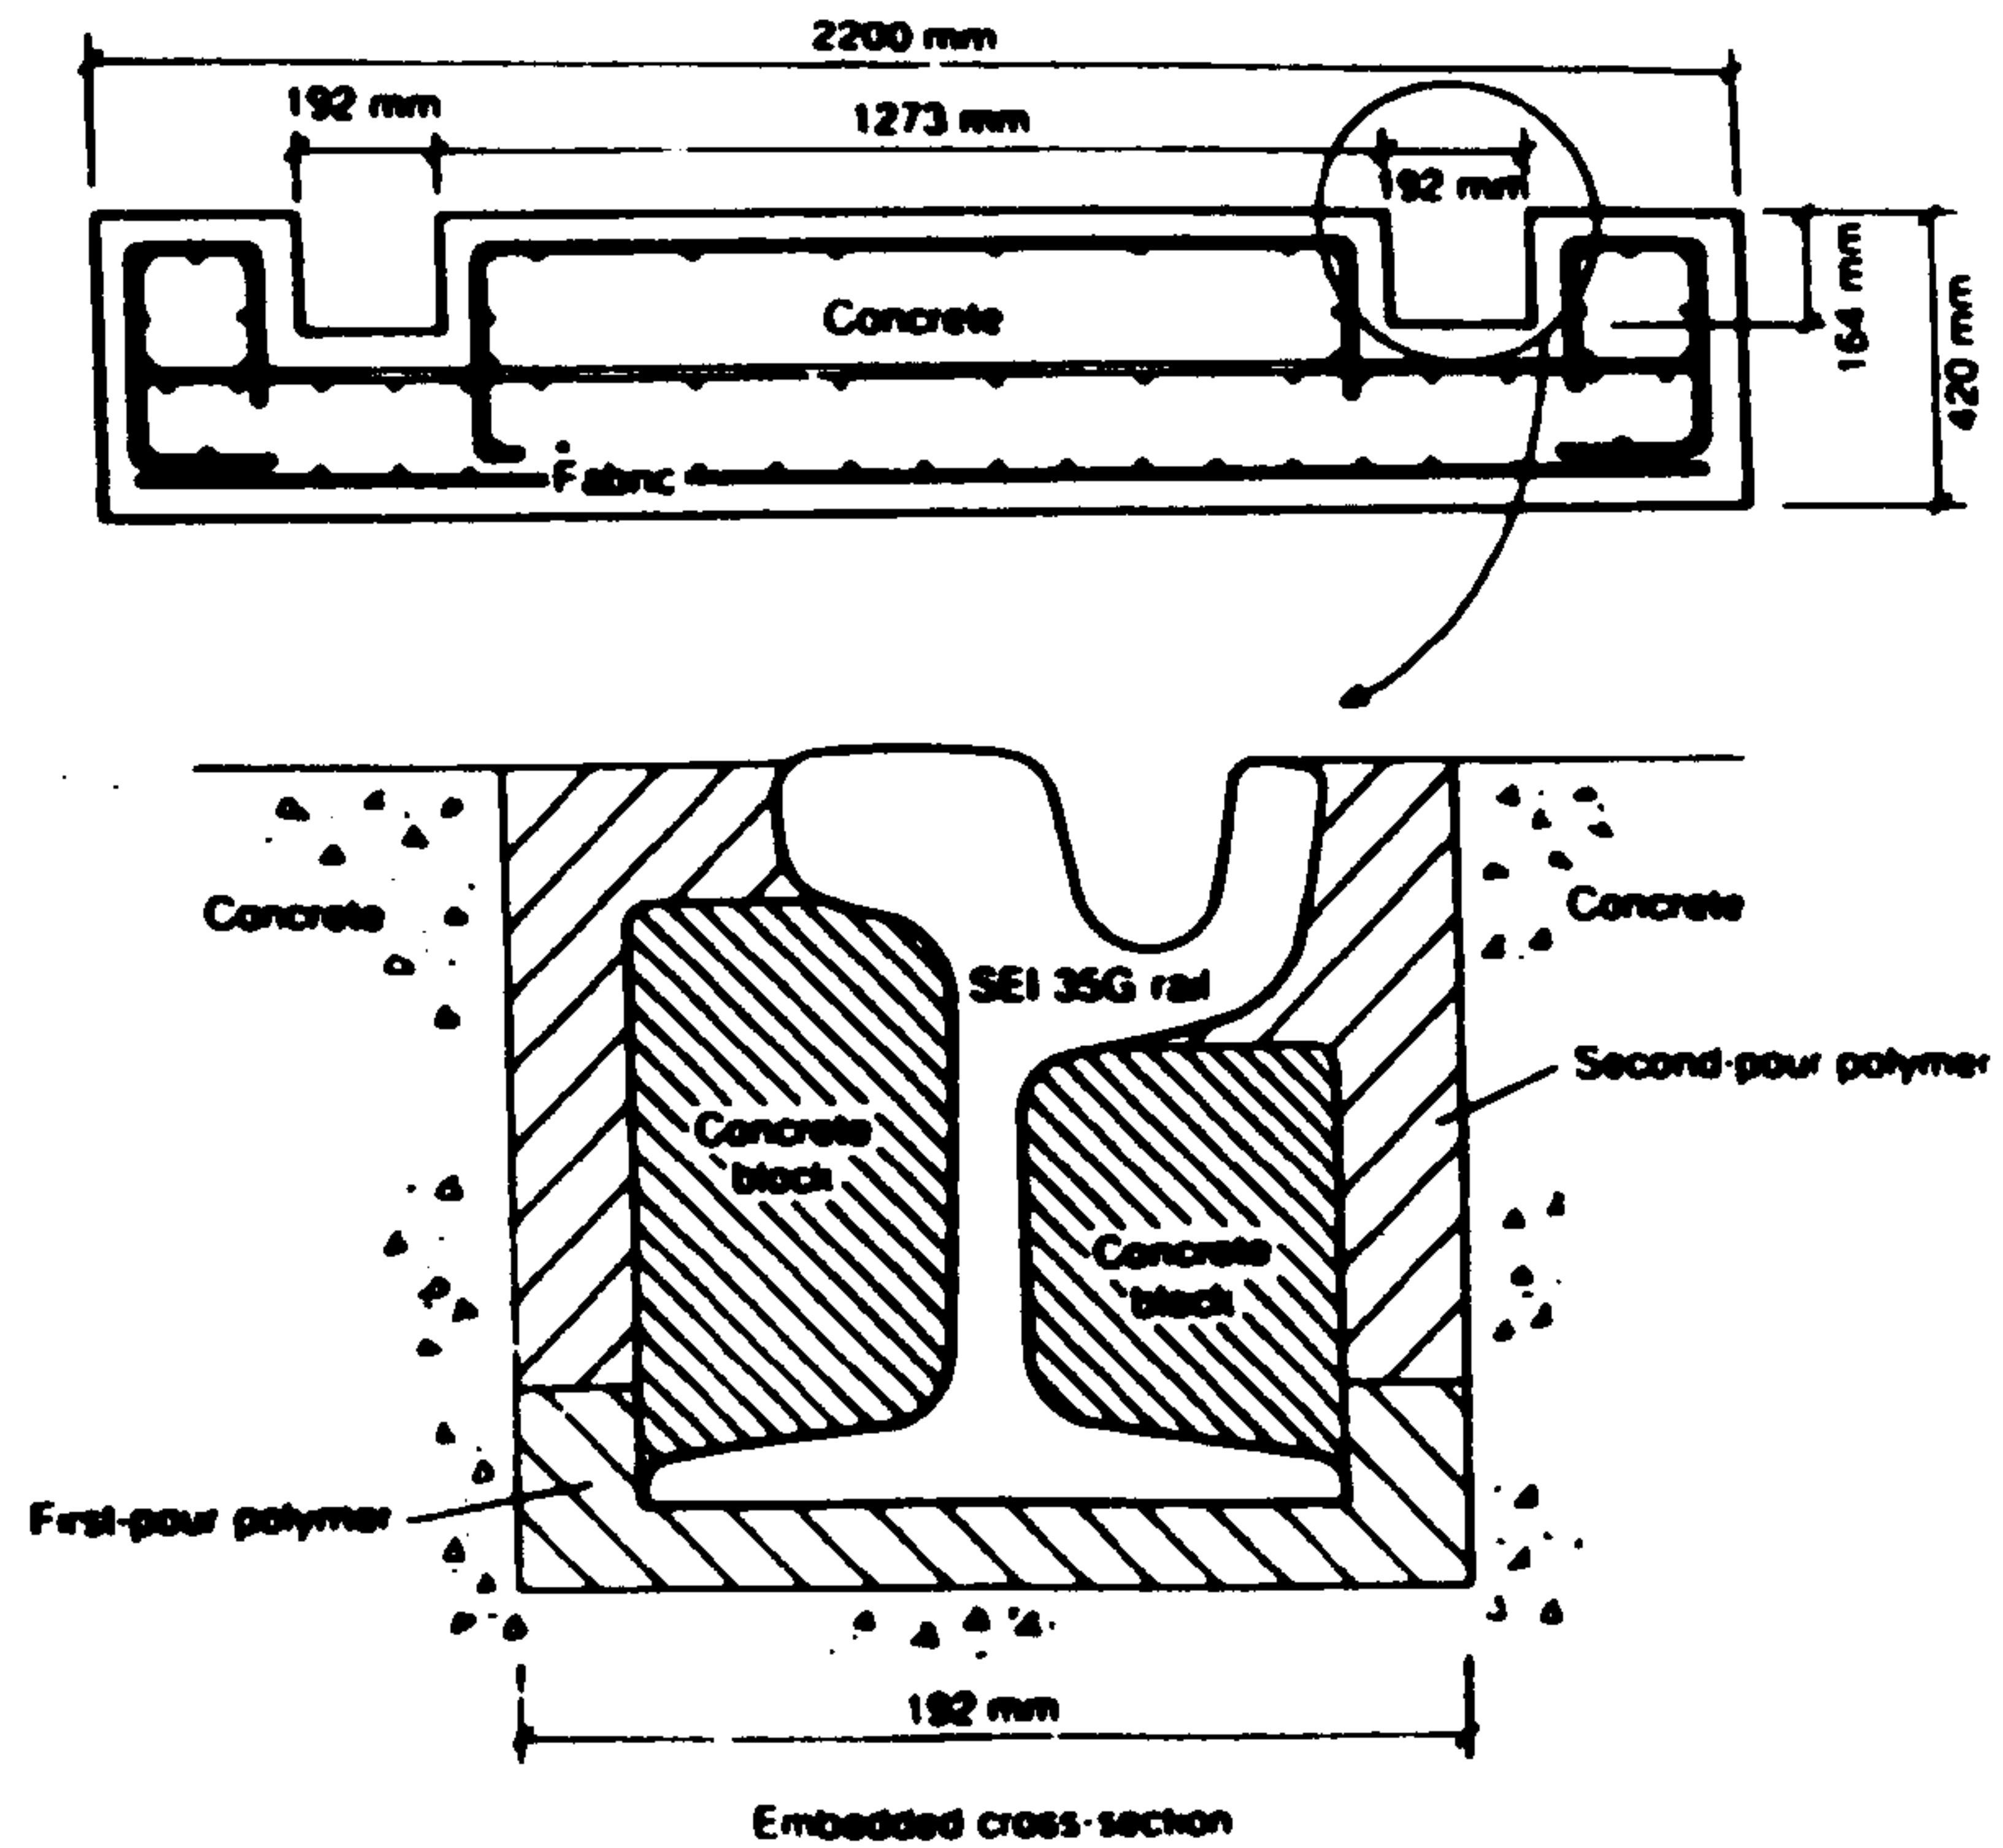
Paved concrete slab track (PACT) used for South Yorkshire Supertram.
